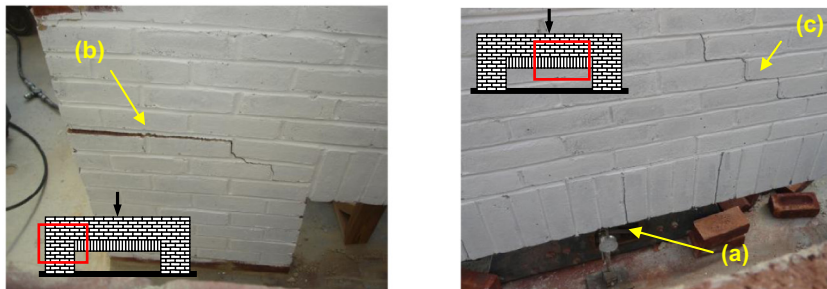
Typical masonry wall panel with opening tested in the laboratory.
